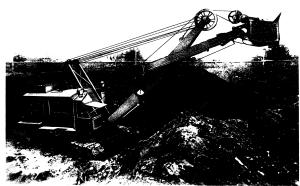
Model 3-2001 Excavator equipped with Straight Shovel.
